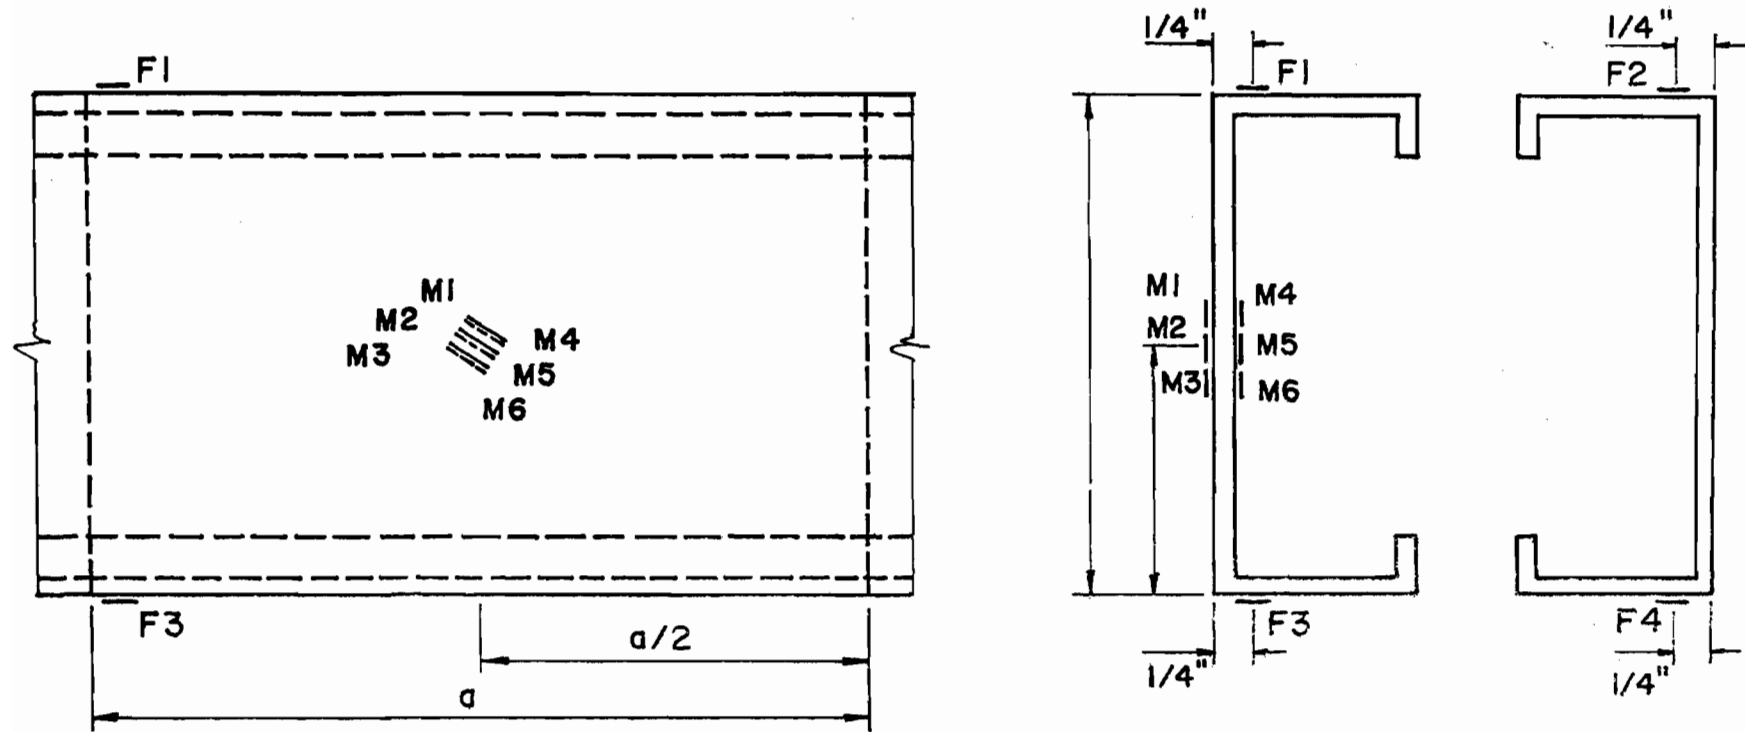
Location of Strain Gages for Beam Specimens (Shear Test Setups-B and D)
